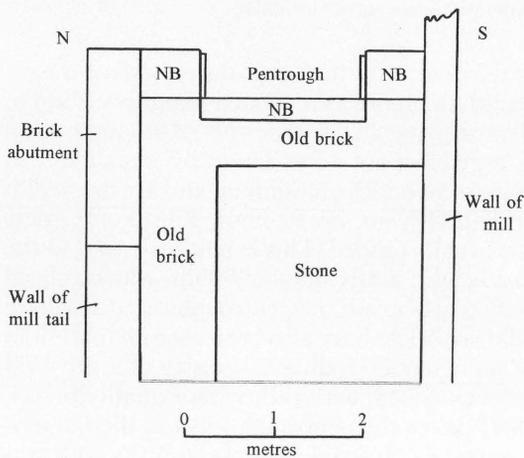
Elevation of the east wall of the wheel pit at Paddington Mill showing the three phases of construction in stone, old brick and new brick (NB) which are discussed in the text. A photograph showing this wall is given as figure 2.
